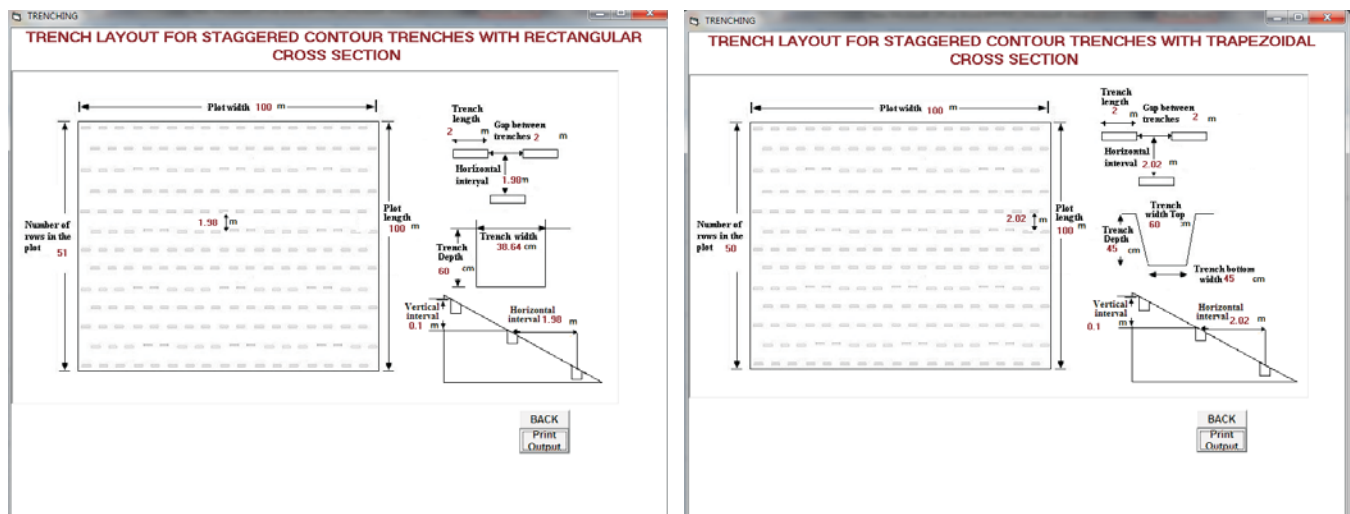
Layouts for staggered trenches with rectangular and trapezoidal cross Section
